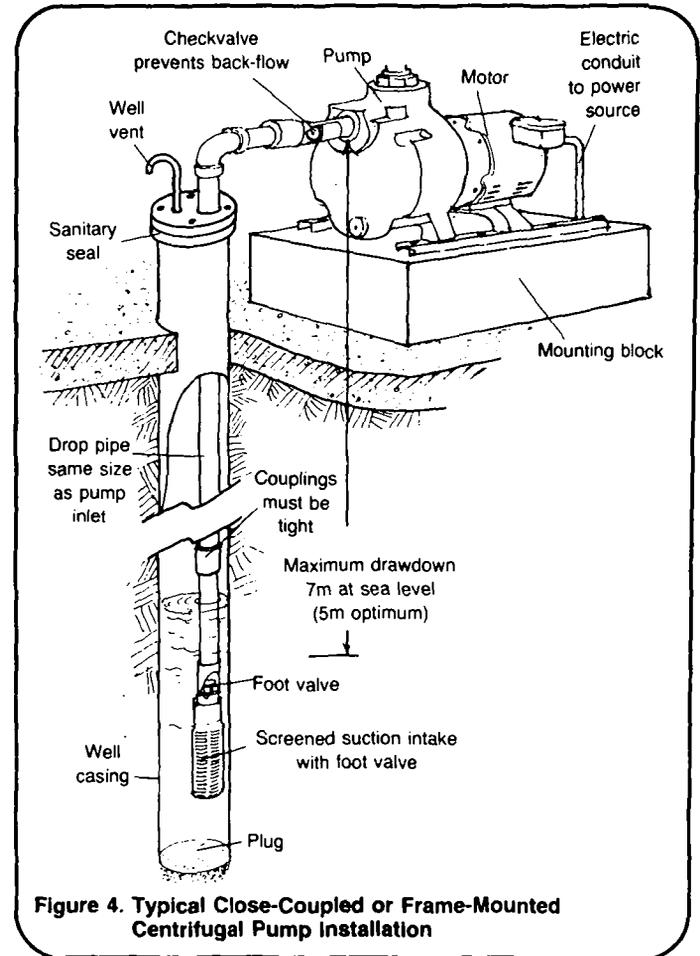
Typical Close-Coupled or Frame-Mounted Centrifugal Pump Installation
